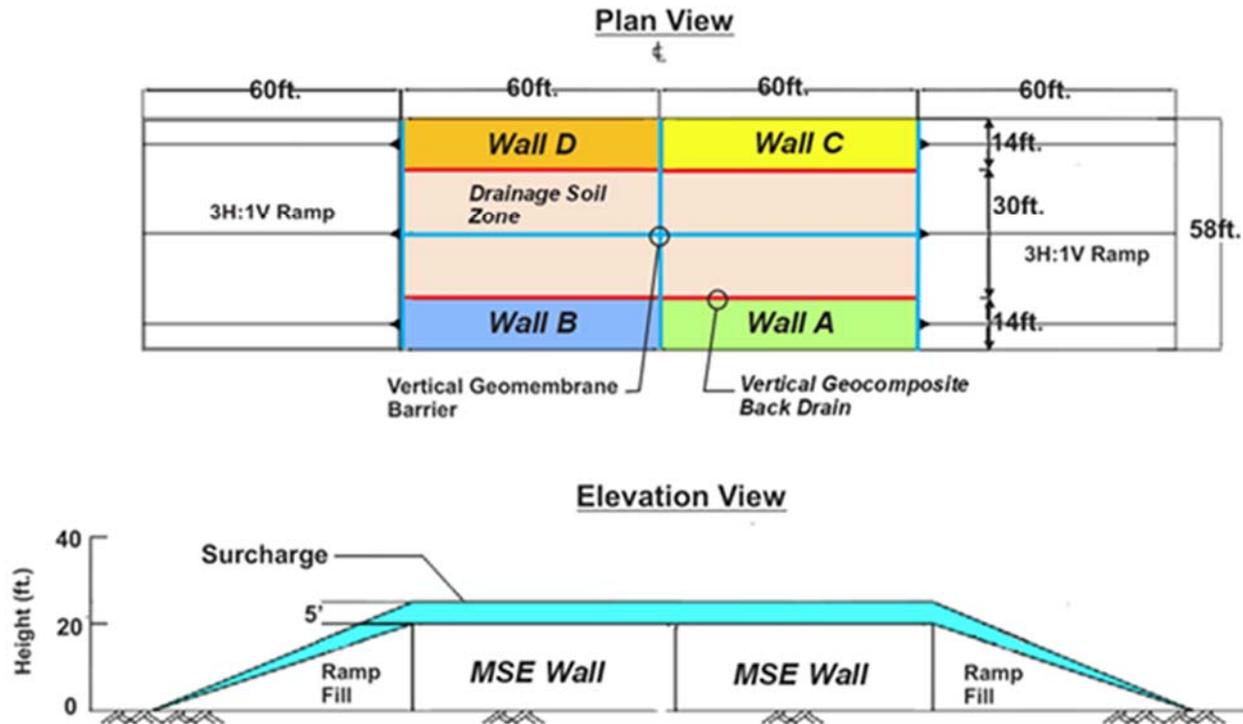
Plan/Elevation of Field Test for MSE Retaining Walls
